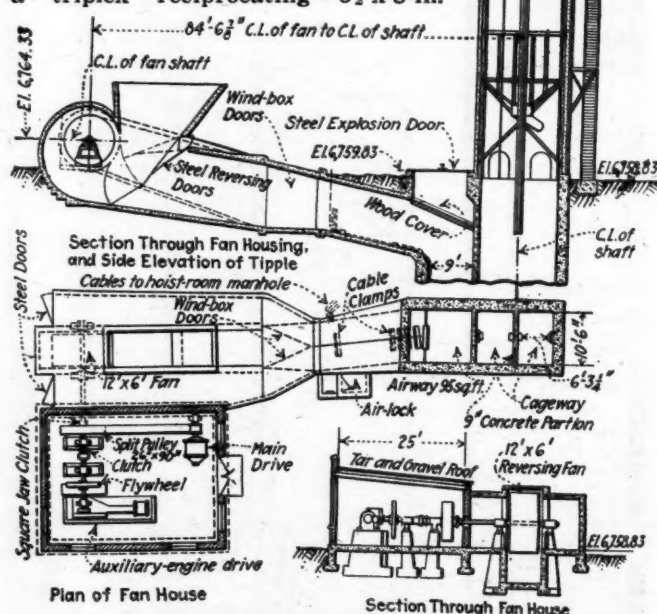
MATERIAL HEADFRAME WITH SECTIONS THROUGH FAN HOUSE
